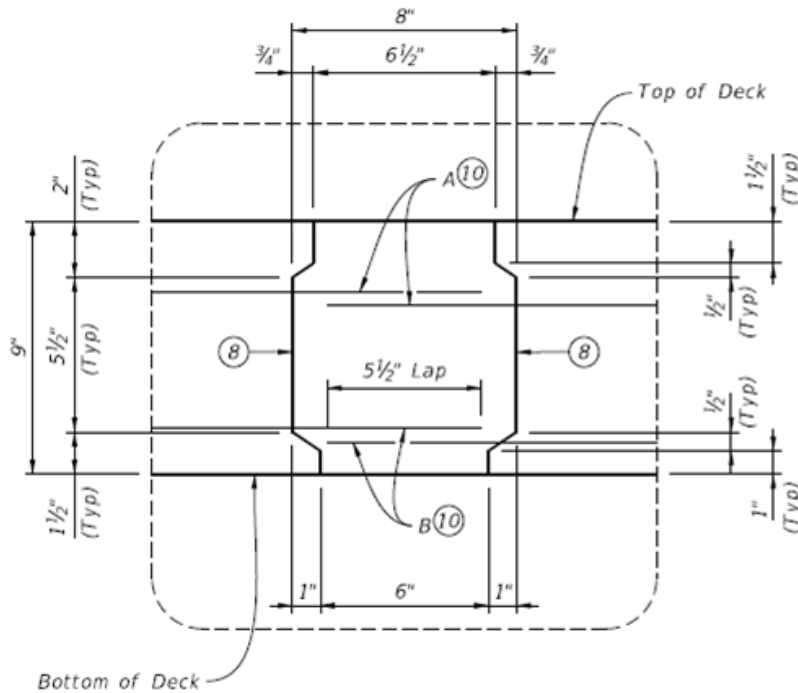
Straight Bar Closure Joint Detail from Farwell Creek Bridge
